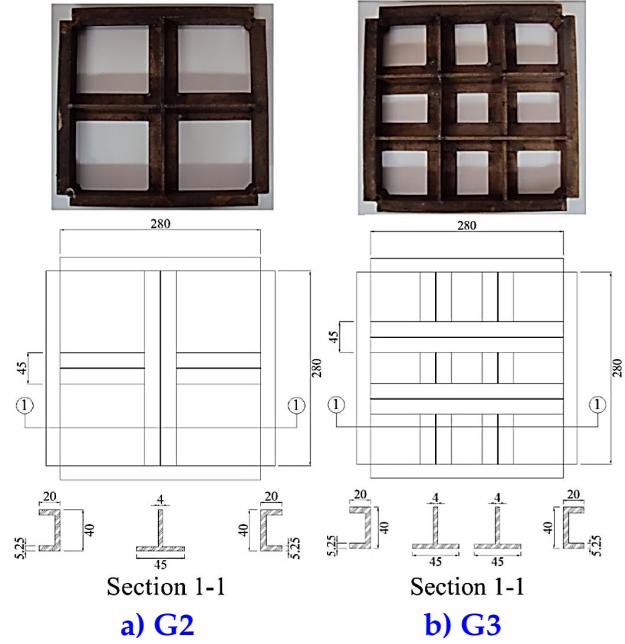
Proposed shearhead layouts by Al-hamid et al. (2018); a) G2; b) G3.
